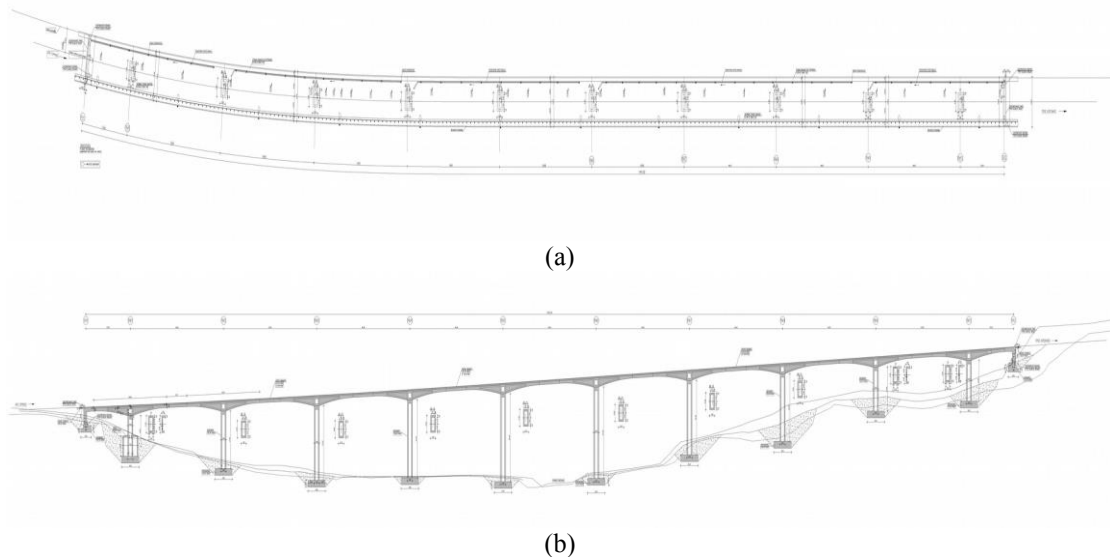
(a) Horizontal section and (b) Longitudinal section of the redesigned bridge.
